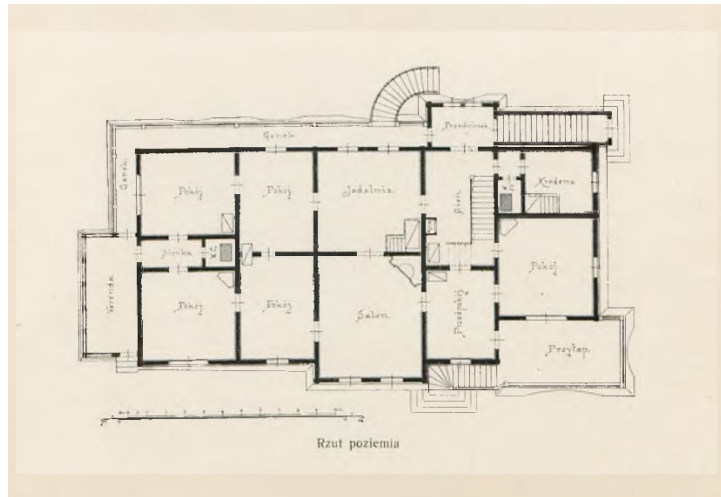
Plan of Ground floor Villa "Pod Jedlami"(Witkiewicz et al. 1911)
